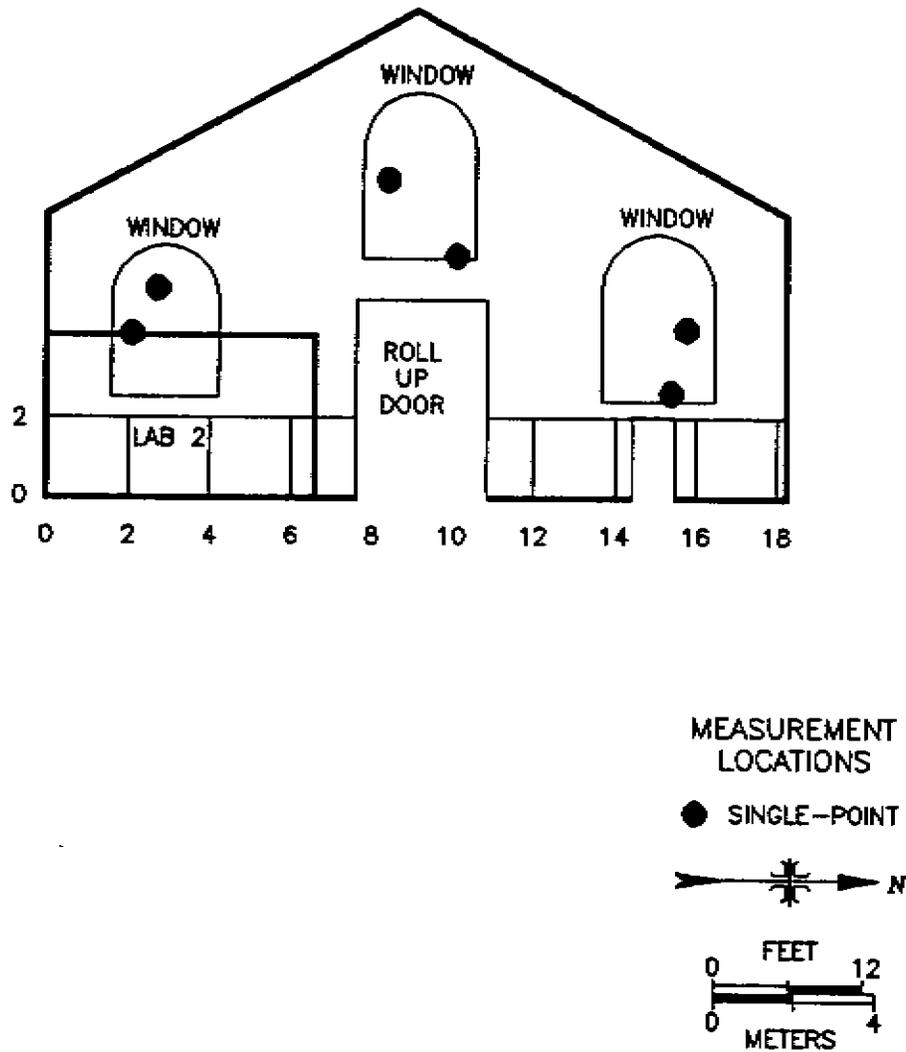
Building 23, West Wall, Indicating Measurement Locations on Windows
